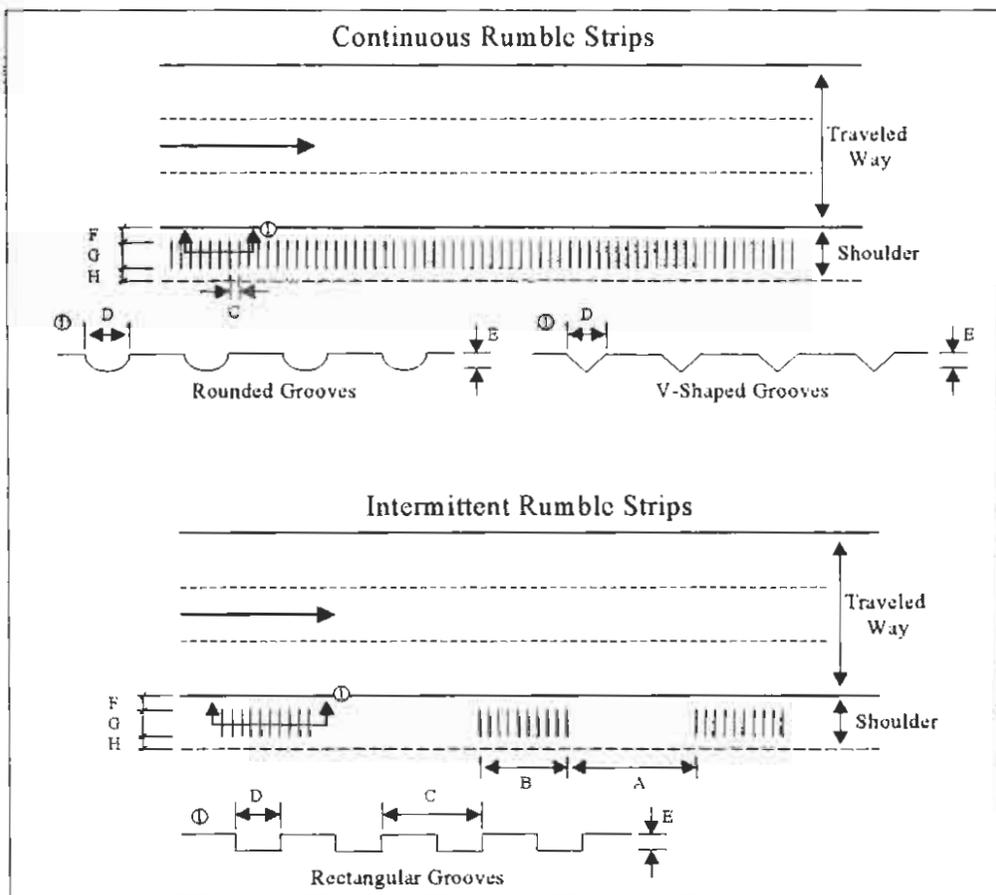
B. Typical rumble strip applications on asphalt shoulders (Harwood 1993).
